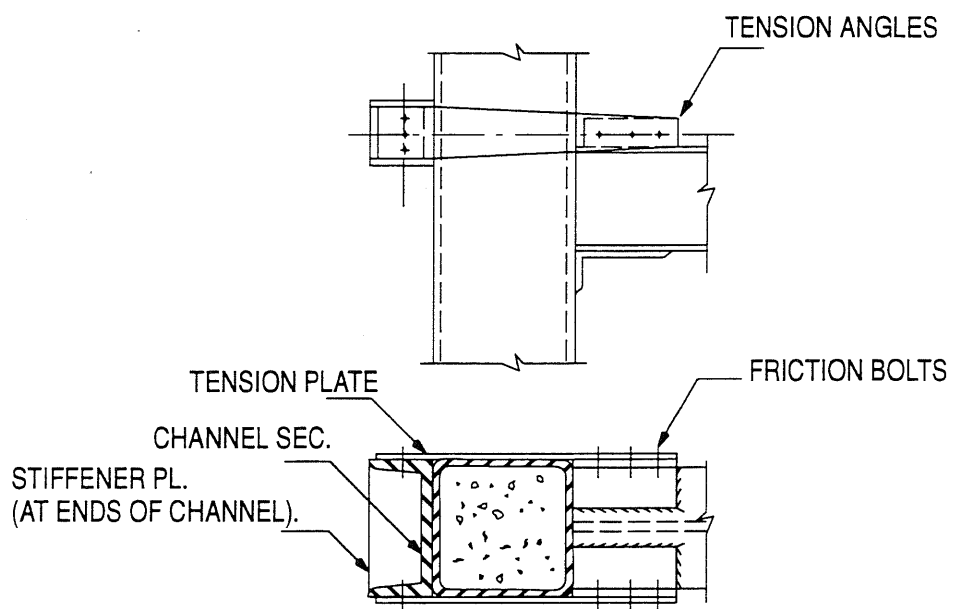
Connections to Reinforced Concrete Columns, Hawkins *et. al.* (1980)
